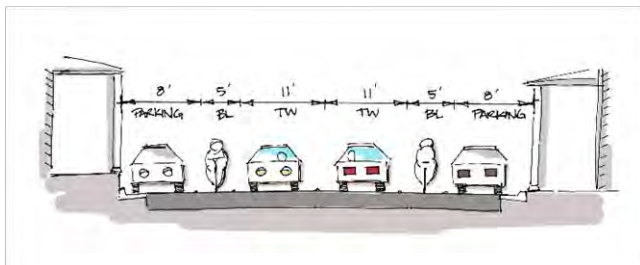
Diamond Springs On Street Parking and Bicycle Lanes Cross Section and Rendering
